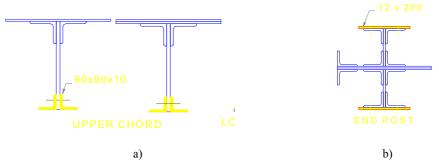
Reinforcement of main girder members: a) upper chord; b) posts
